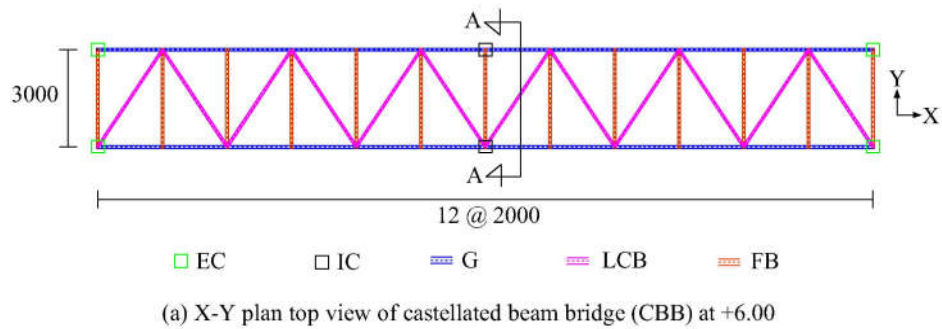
Pedestrian castellated beam bridge (unit: mm)
